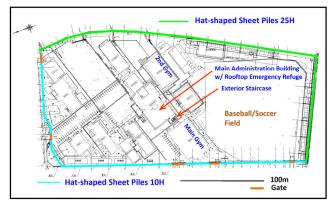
Plan view of the campus showing the locations of flood walls and buildings
